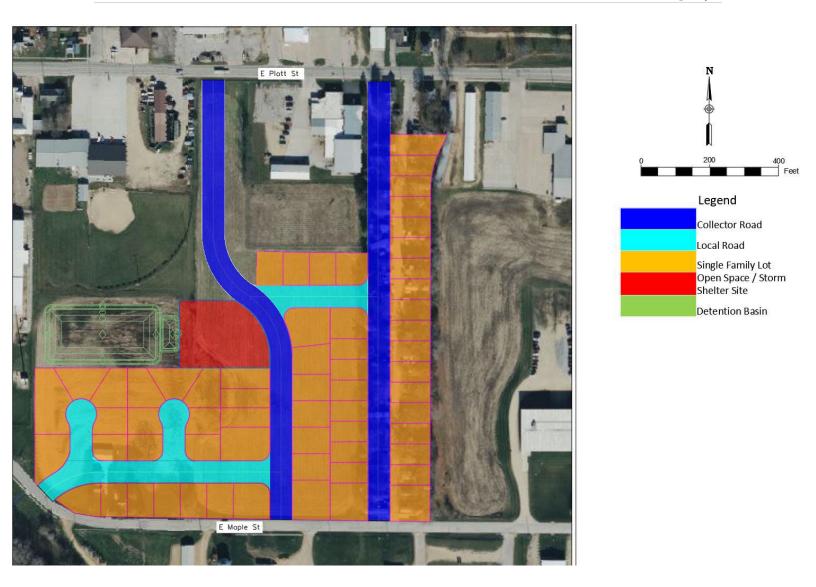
Final Roadway layout of 1015 E. Platt St
